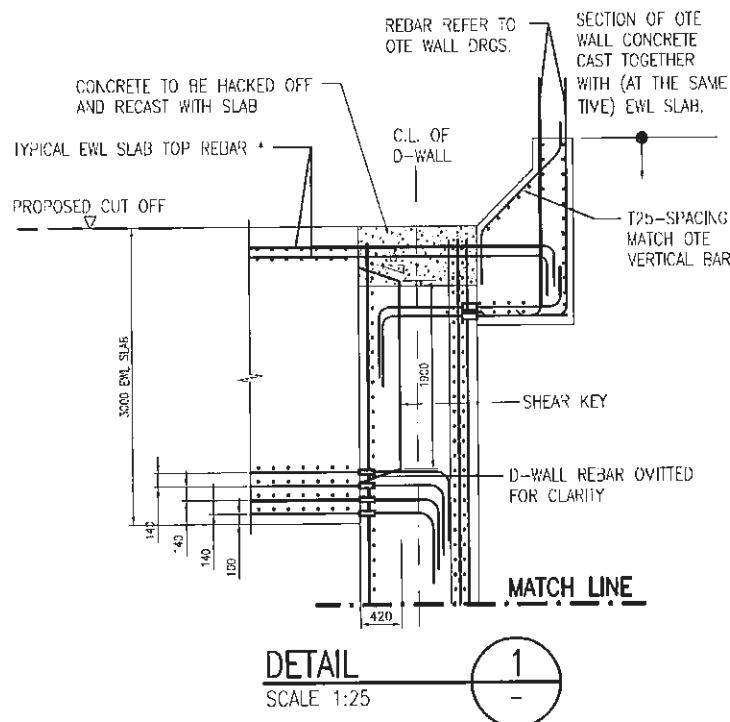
A typical slab-wall joint (from Detail 1 of [J6/4071])
